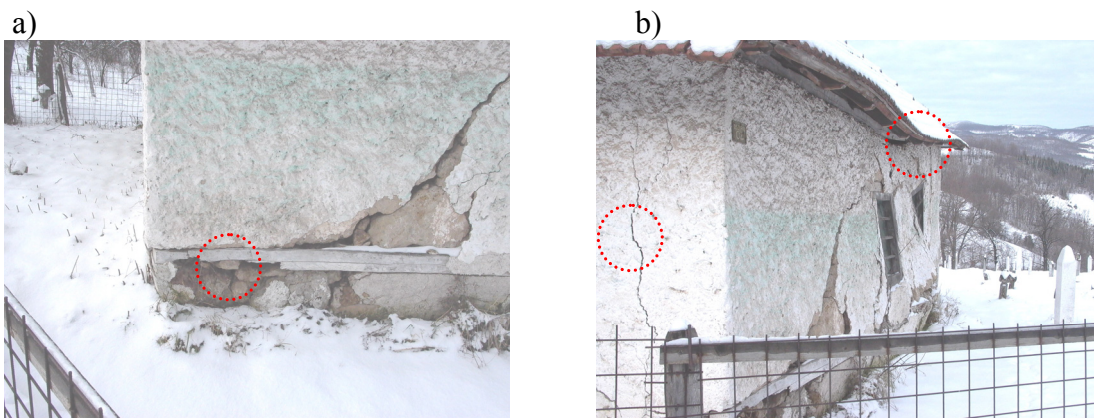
Northeast façade extracts a) further timber decay, b) structural cracking extended to the southeast façade, eaves deflection evident
